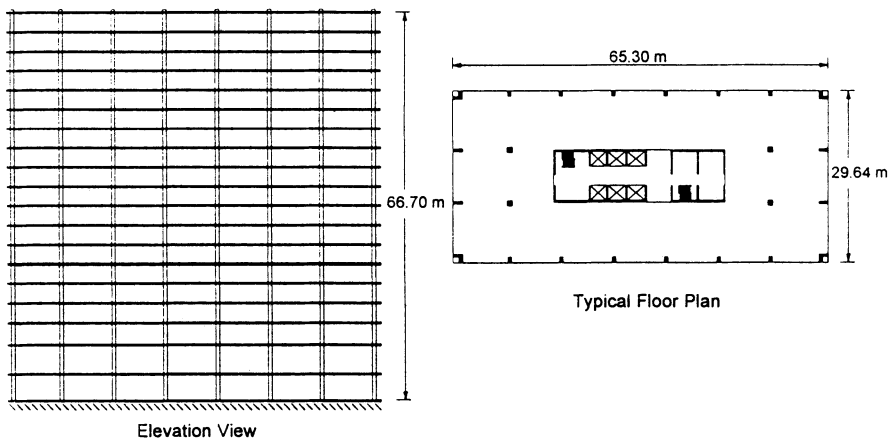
Elevation and Typical Floor Plan of Minillas Government Center, North Building.
